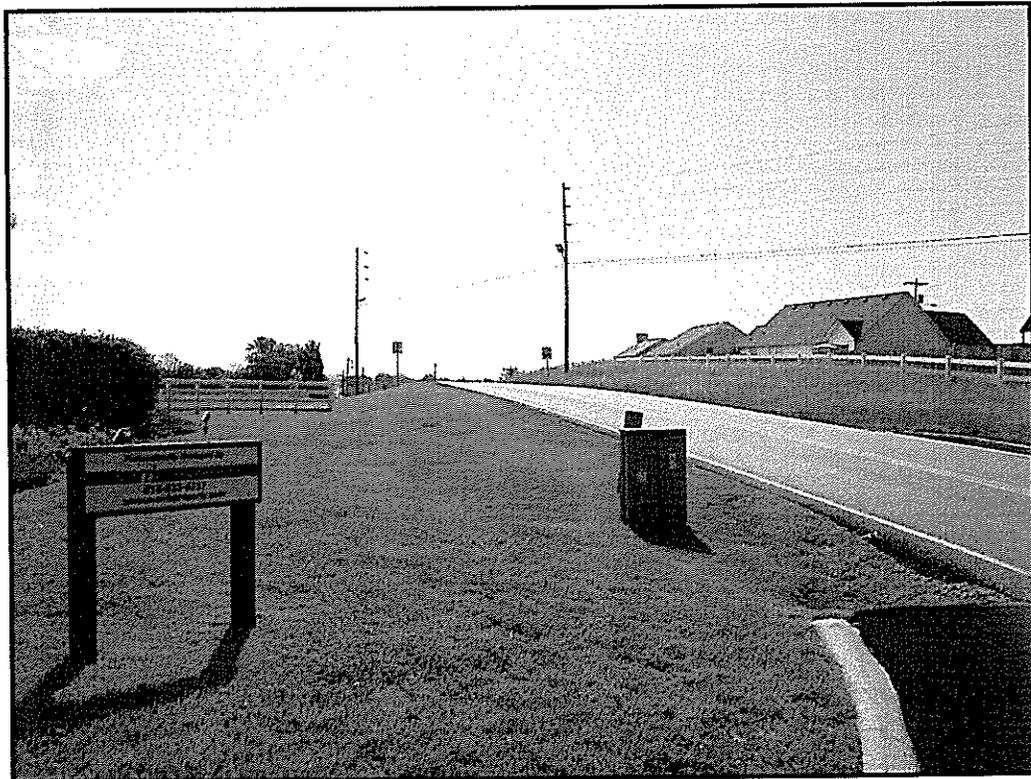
View facing east along State Route 247 at intersection of Port Royal Road
